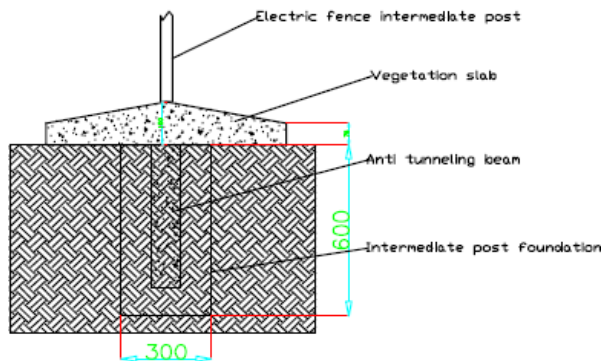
Vegetation Slab and Anti-tunnelling Beam Elevation Detail
